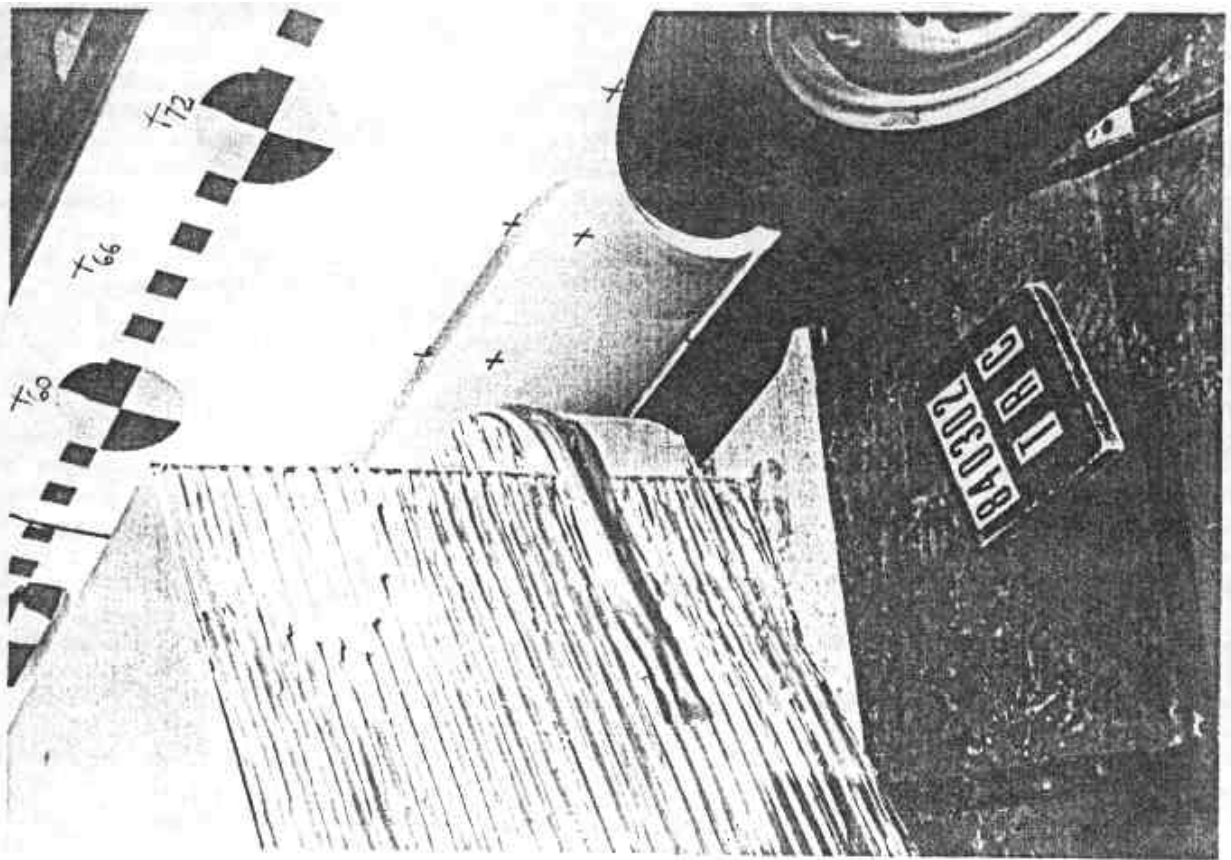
PRE-TEST CLOSEUP - VIEW 3
